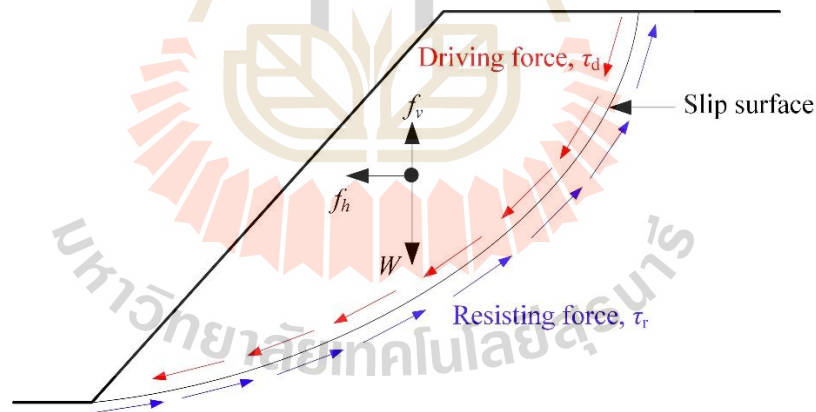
Forces acting on a slope in pseudo-static slope stability analysis
